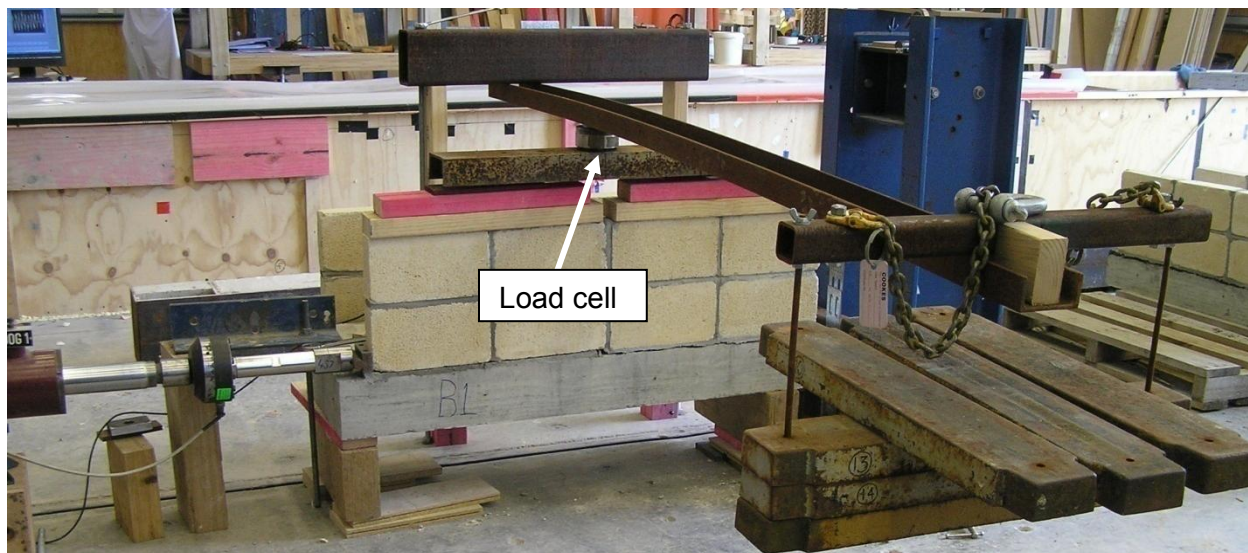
Shear test set-up for brick-to-concrete foundation joint
